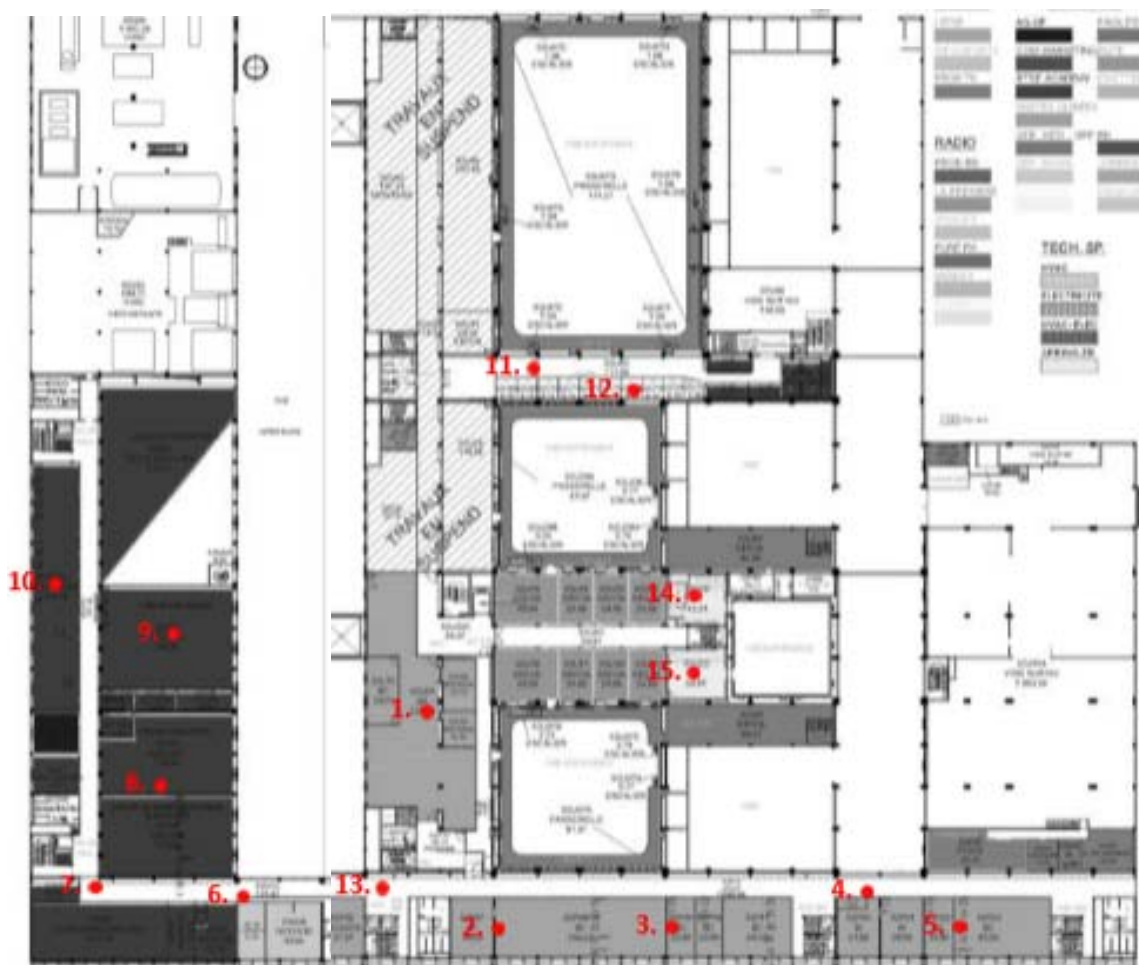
Placement Access Points for Floor 2 in Building CHJM
